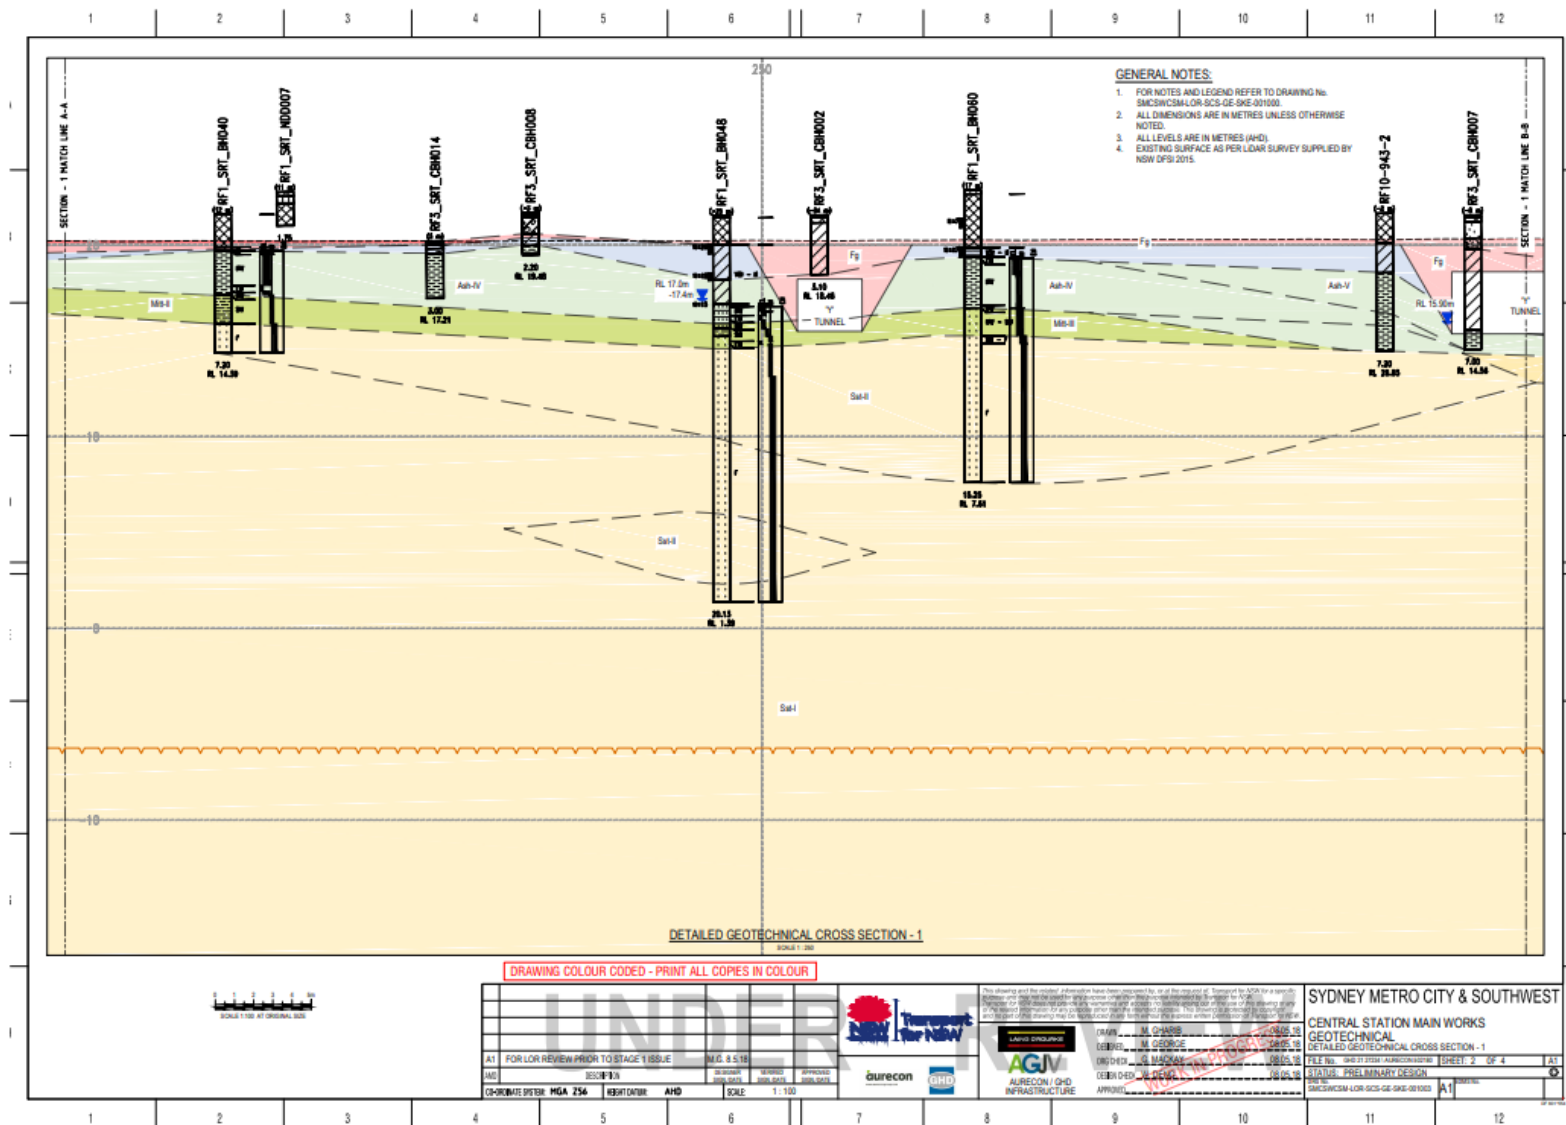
Geotechnical cross section for Central Station Main Works station box site
